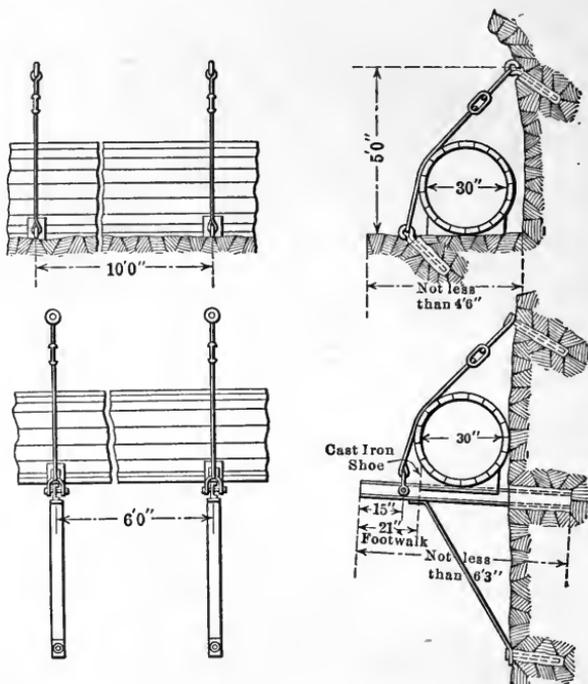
Method of supporting Canyon City pipe line on rock bench and vertical bluff. Colo.
